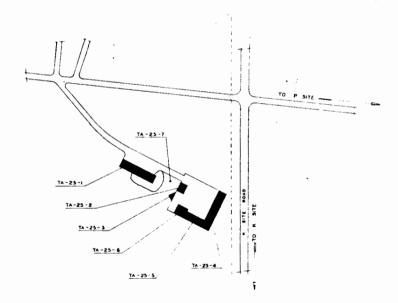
Structure Location Plan for TA-25 - V Site (1950 Drawing from the LANL Technical Area Structure Location Plans)
